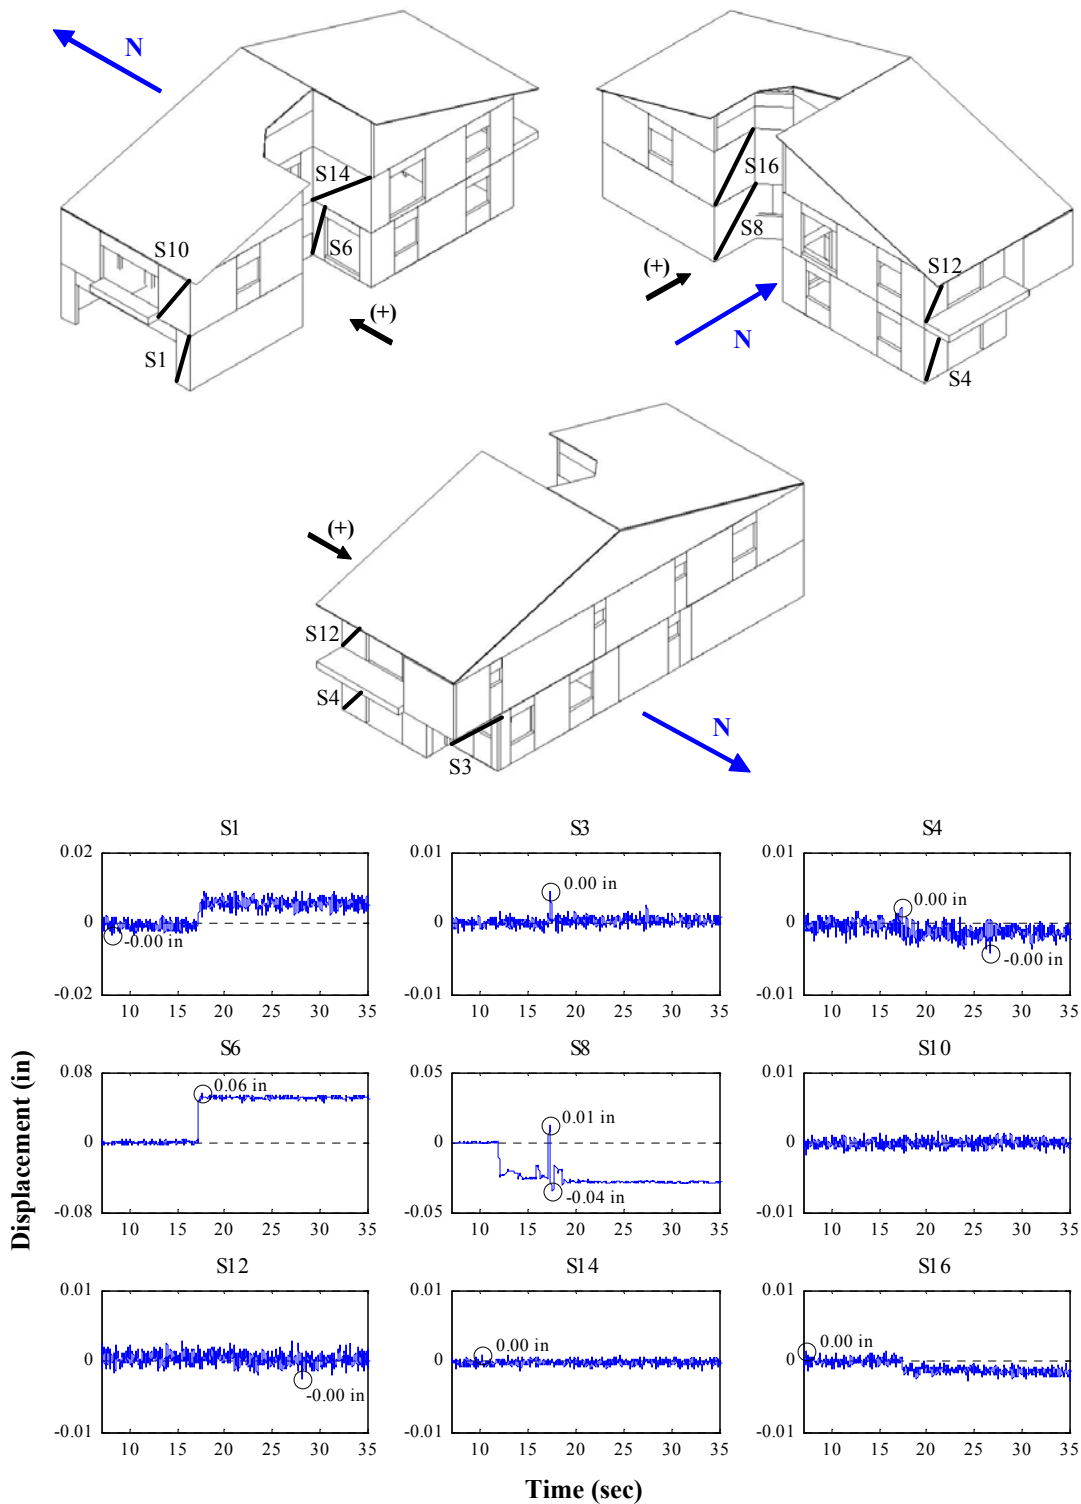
Wall deformations of north-south external walls for Test NWP1S01
